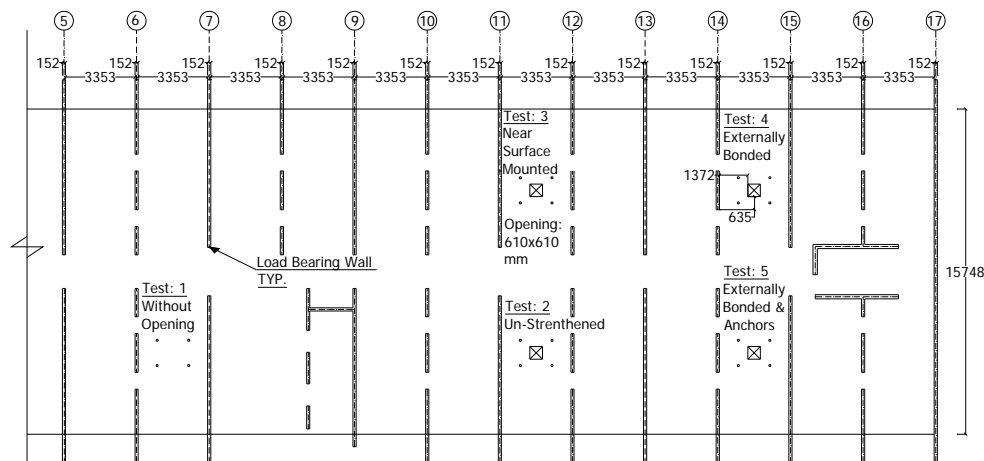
Partial floor plan and layout of tests (dimensions are in millimeter).
